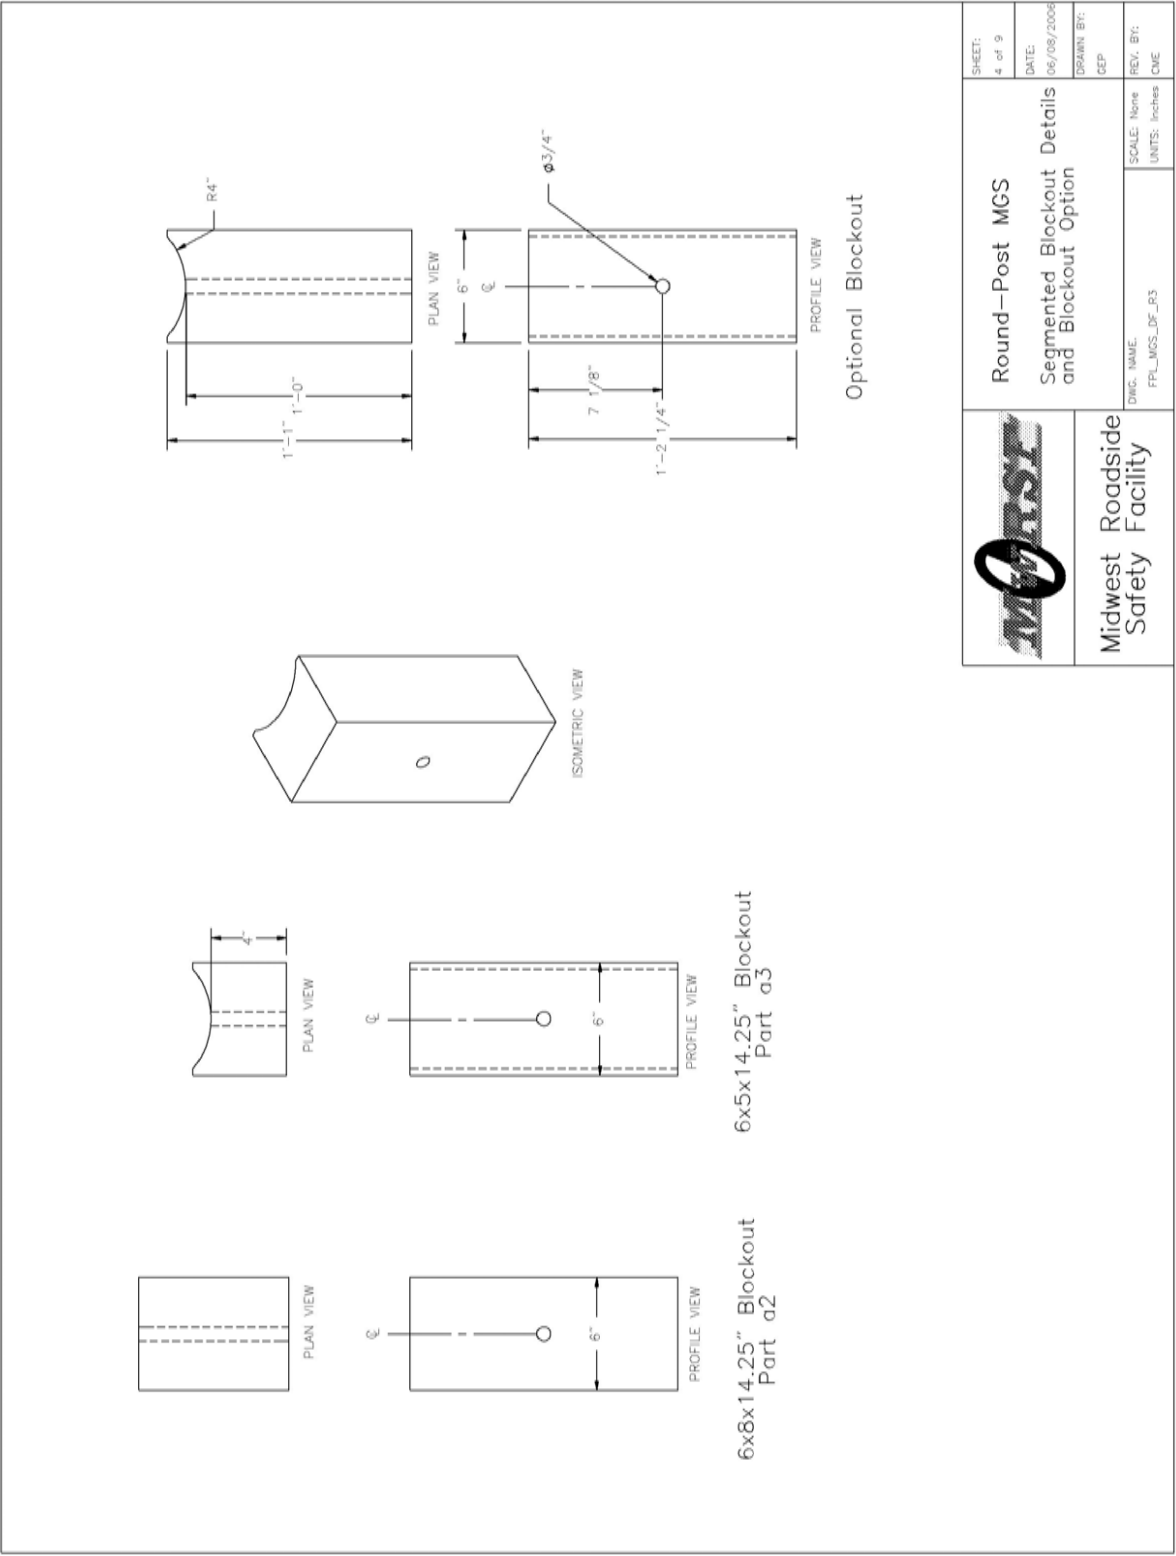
MGS Round Post Douglas Fir English Details – Segmented Block Detail
